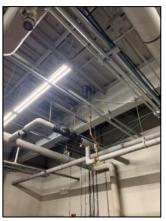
Press-Connect Fittings on a Recently Installed Roof Hydrant
